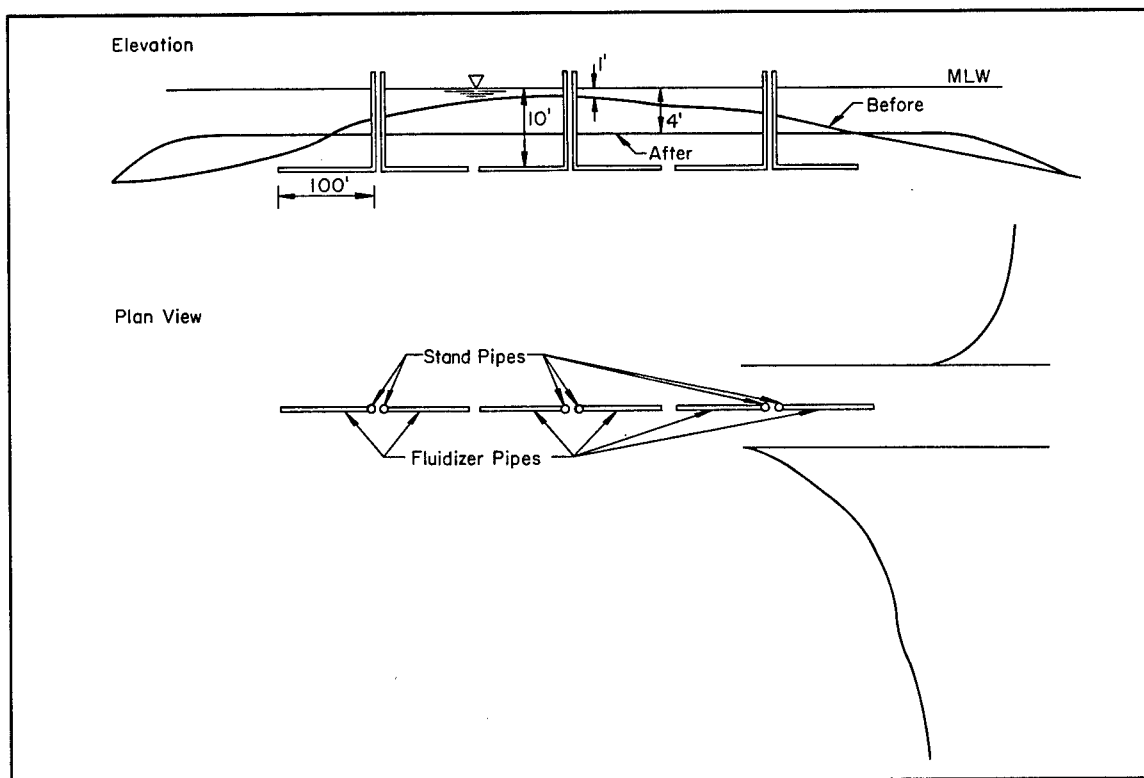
Elevation and plan views of modular fluidizer pipe and stand pipe configuration used at Lake LaVista Channel, Anna Maria, Florida
